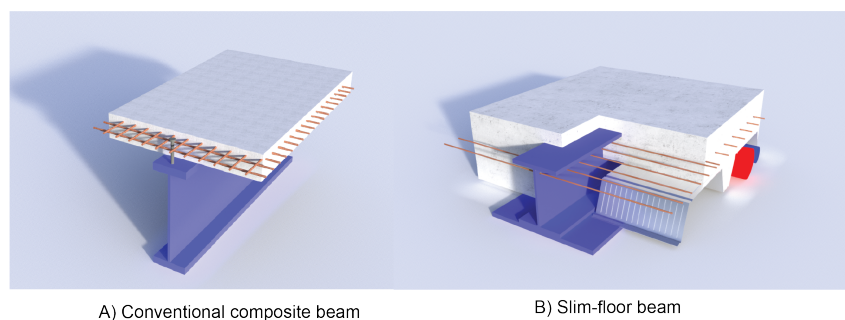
Example of a conventional composite beam and a slim-floor beam
